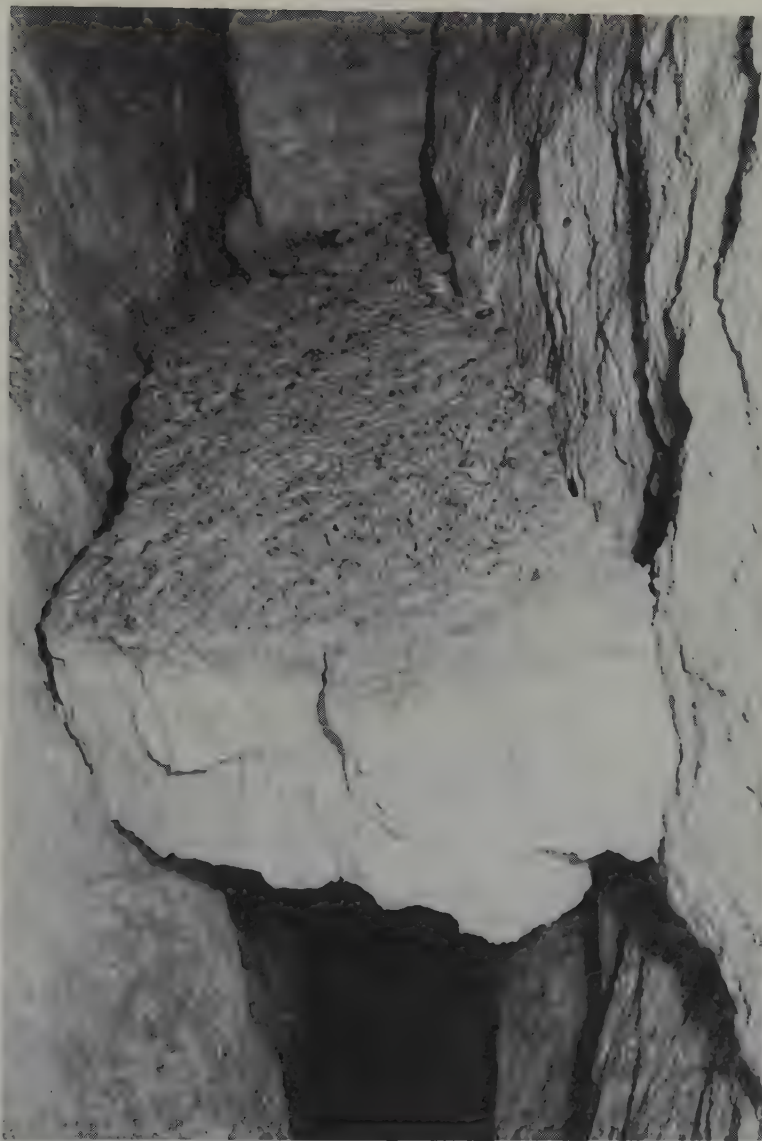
The lay-out of streets should take into account the dip and strike of the beds. Excavation for sewerage brought about the movement of shales along bedding surface *a*.
